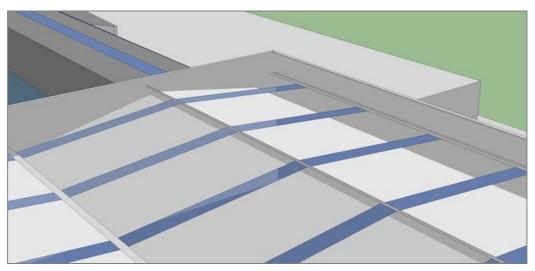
Roof parapet shadowing effect on a possible solar field layout.
